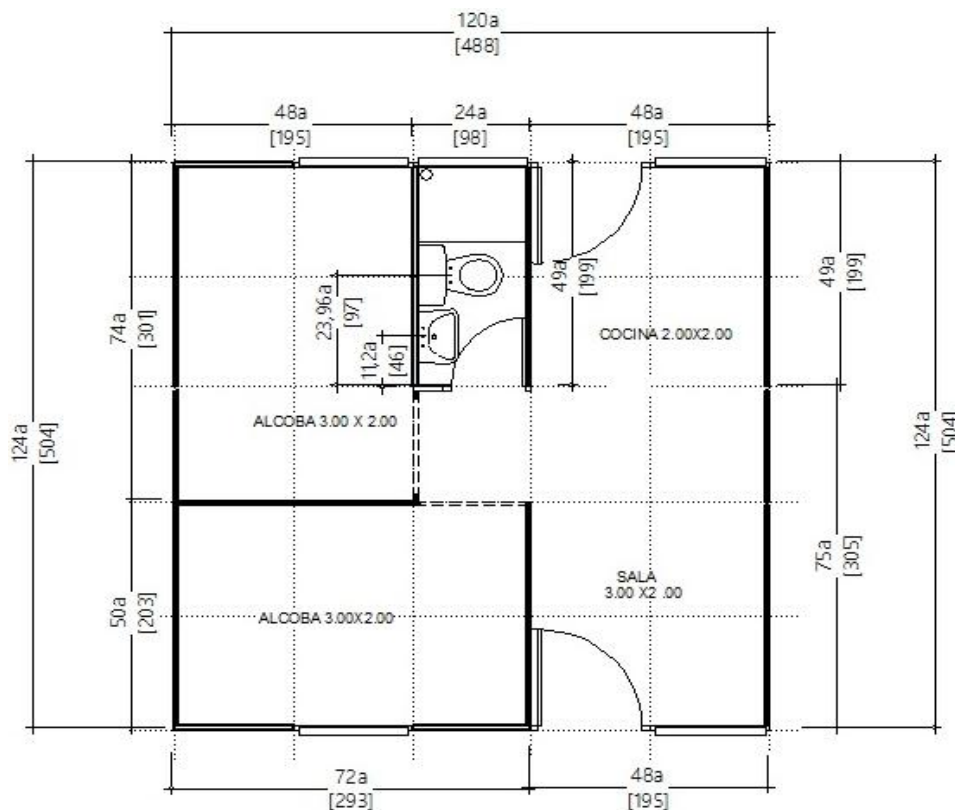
Floor plan showing spatial arrangement of the prefabricated house
